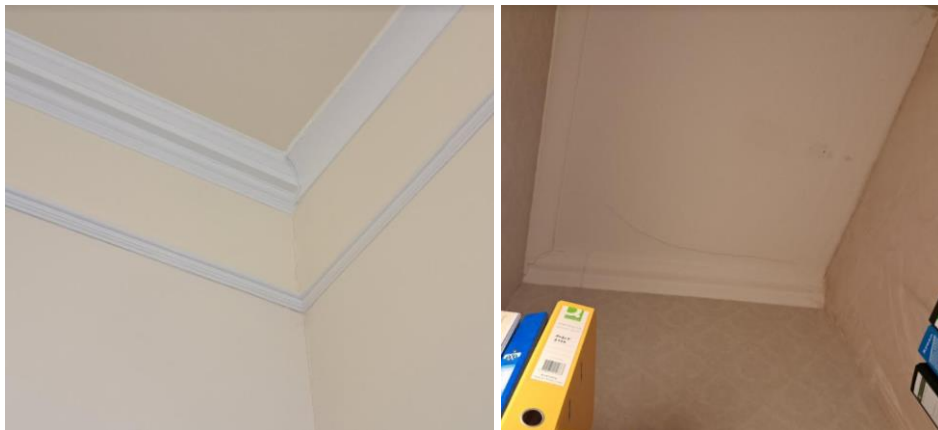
Replacement cornice on stud wall Fig 31 Cupboard formed in w.c.
